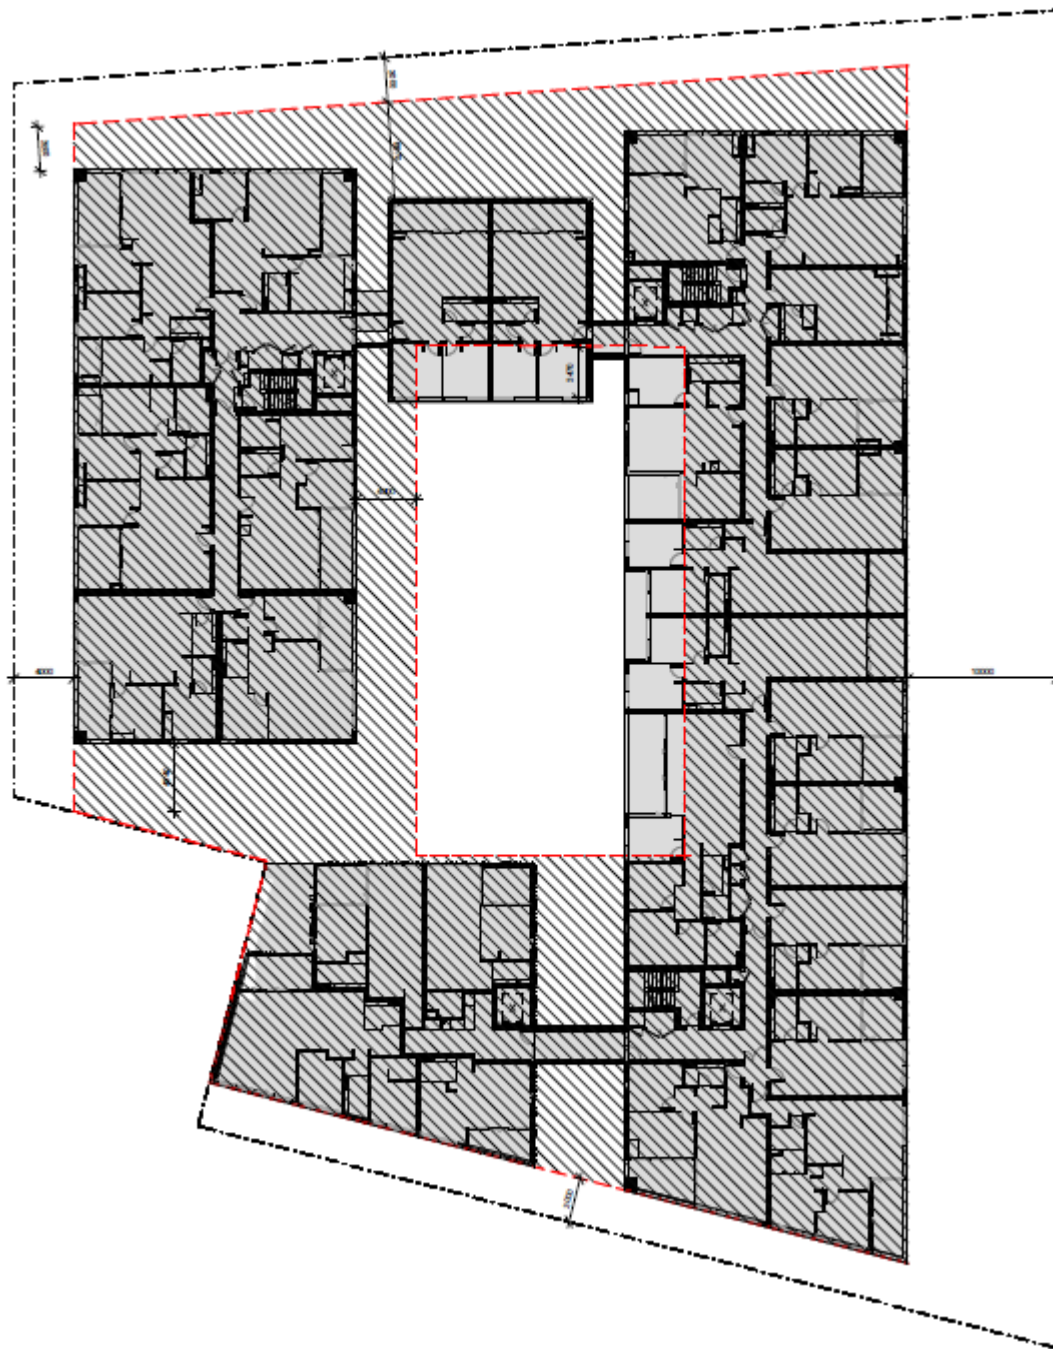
Proposed building footprint in relation to the approved envelope plan (hatched)
